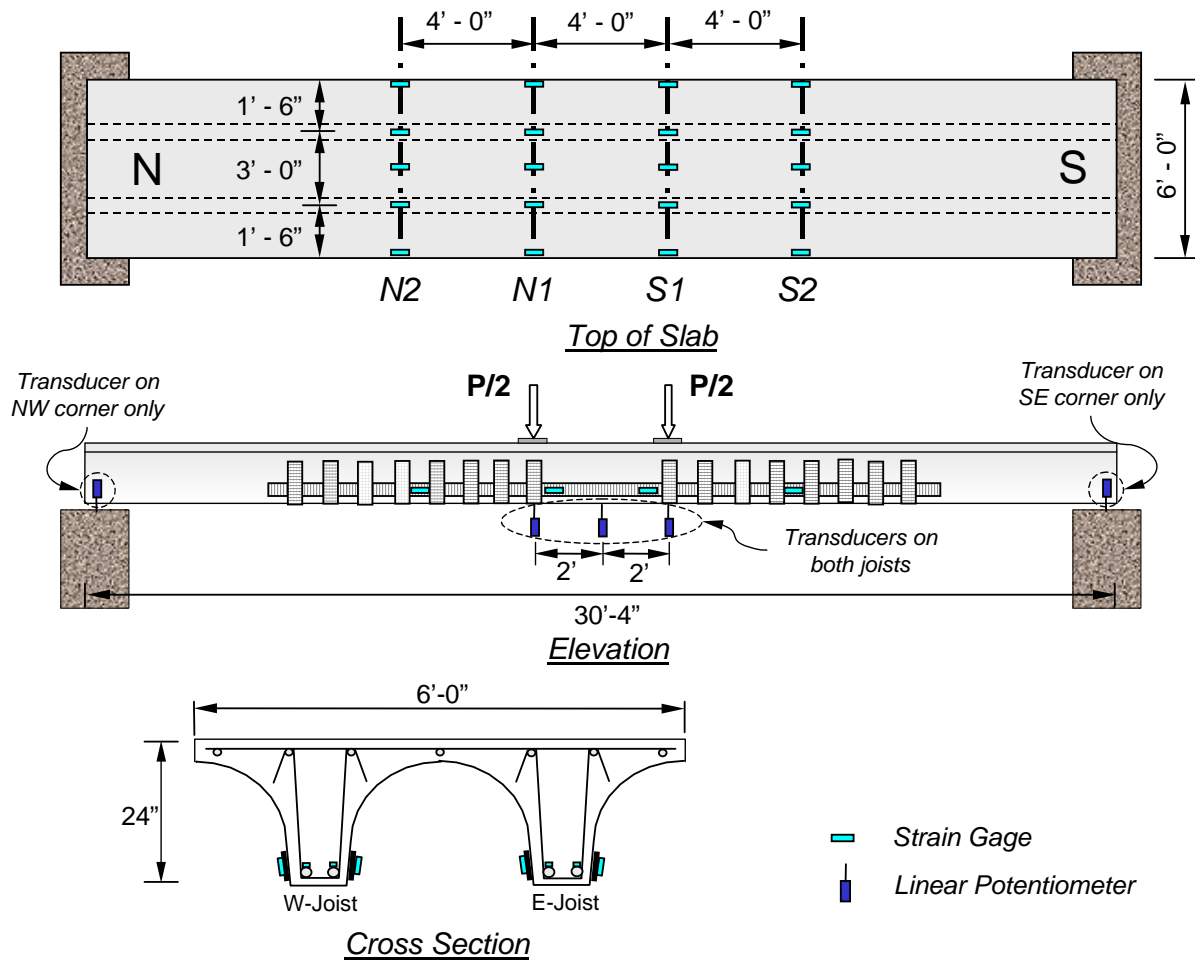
Location of Instrumented Sections Showing Position of Potentiometers and Strain Gages in Specimen J-1
